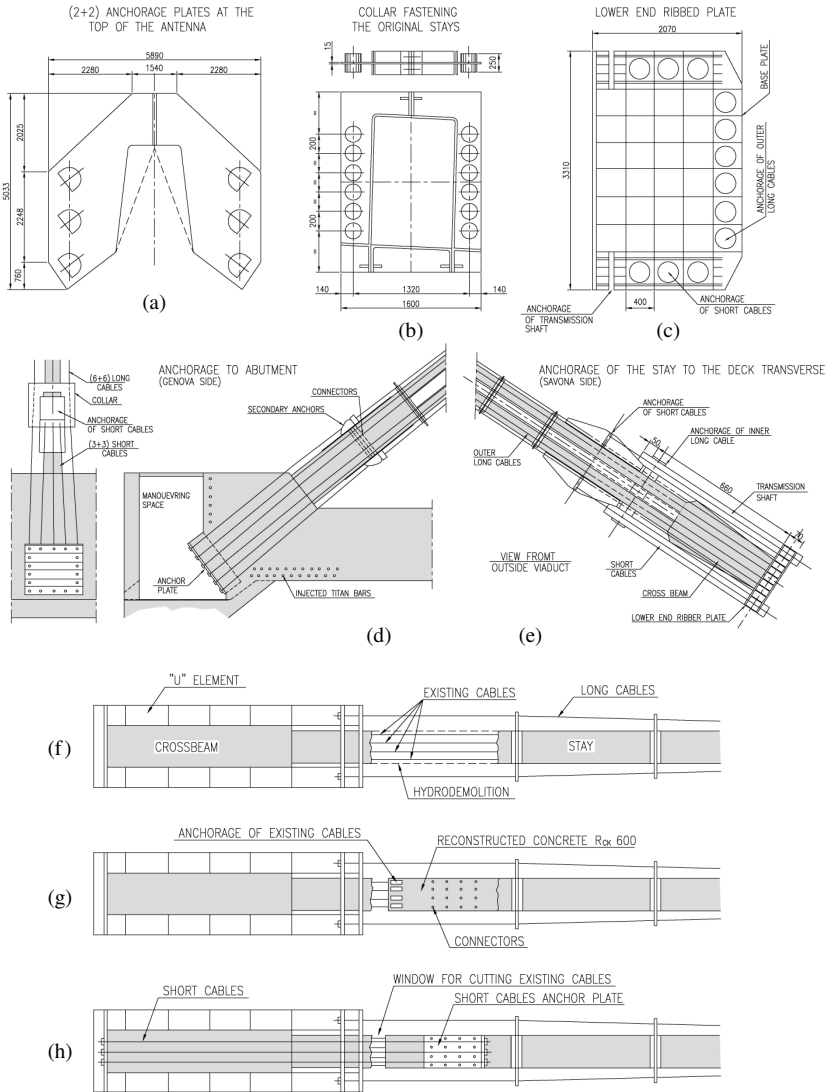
Polcevera Bridge (1960-64). (a) anchorage plates at the top of the antenna; (b) collar fastening the original stays; (c) lower end ribbed plate; (d) anchorage of the tie to the abutment; (e) anchorage of the stay to deck transverse; (f), g), (h) phases of demolition and of reconstruction of the end zones of the ties.
